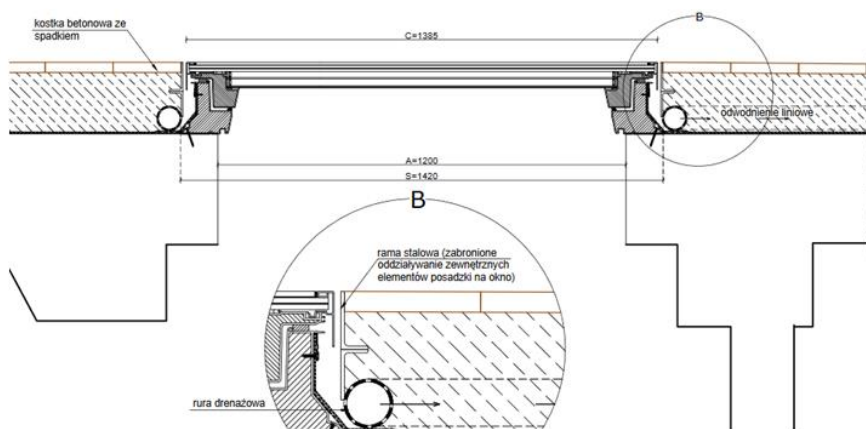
Proposal for illumination of underground storeys (authors' own source).
